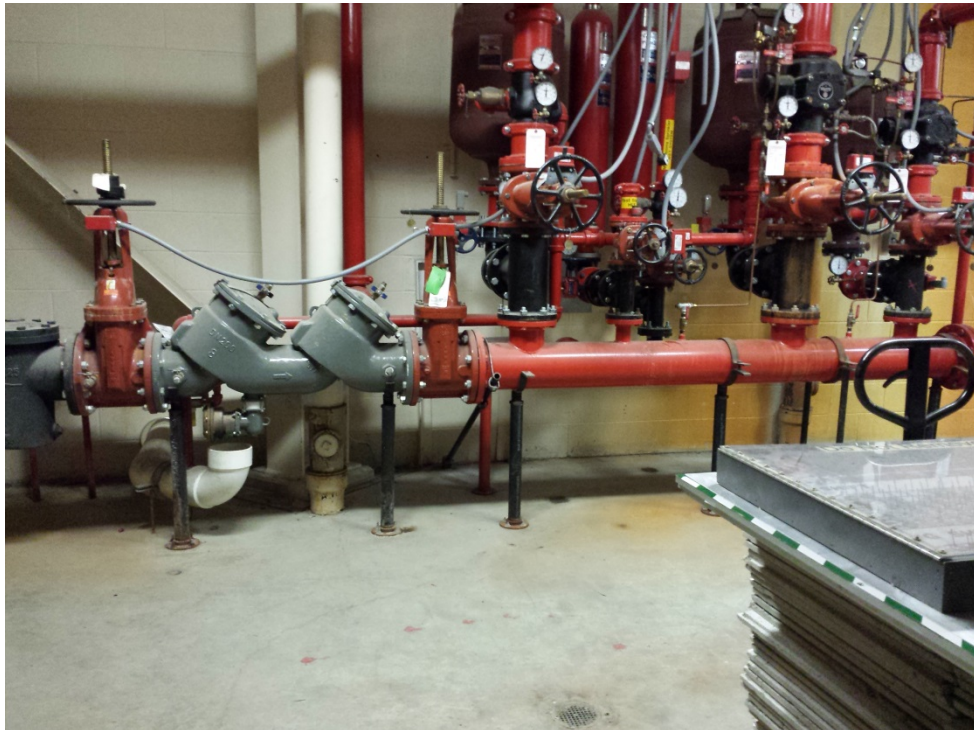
Staining on the walls and floor of the Electrical and Fire Protection Equipment Room in Hangar 102 was observed.
